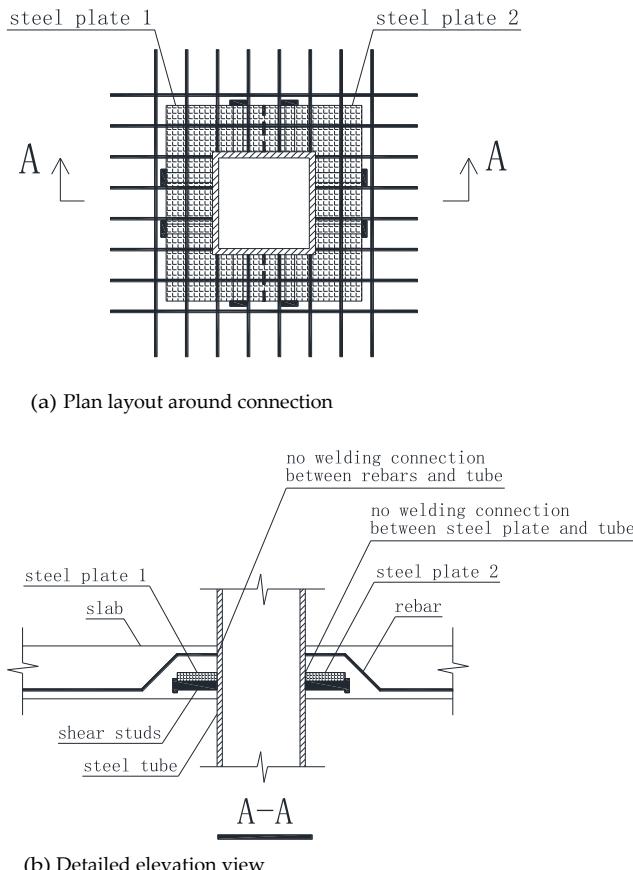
Proposed steel tube to concrete flat slab connection detail(Yu and Wang, 2020).
